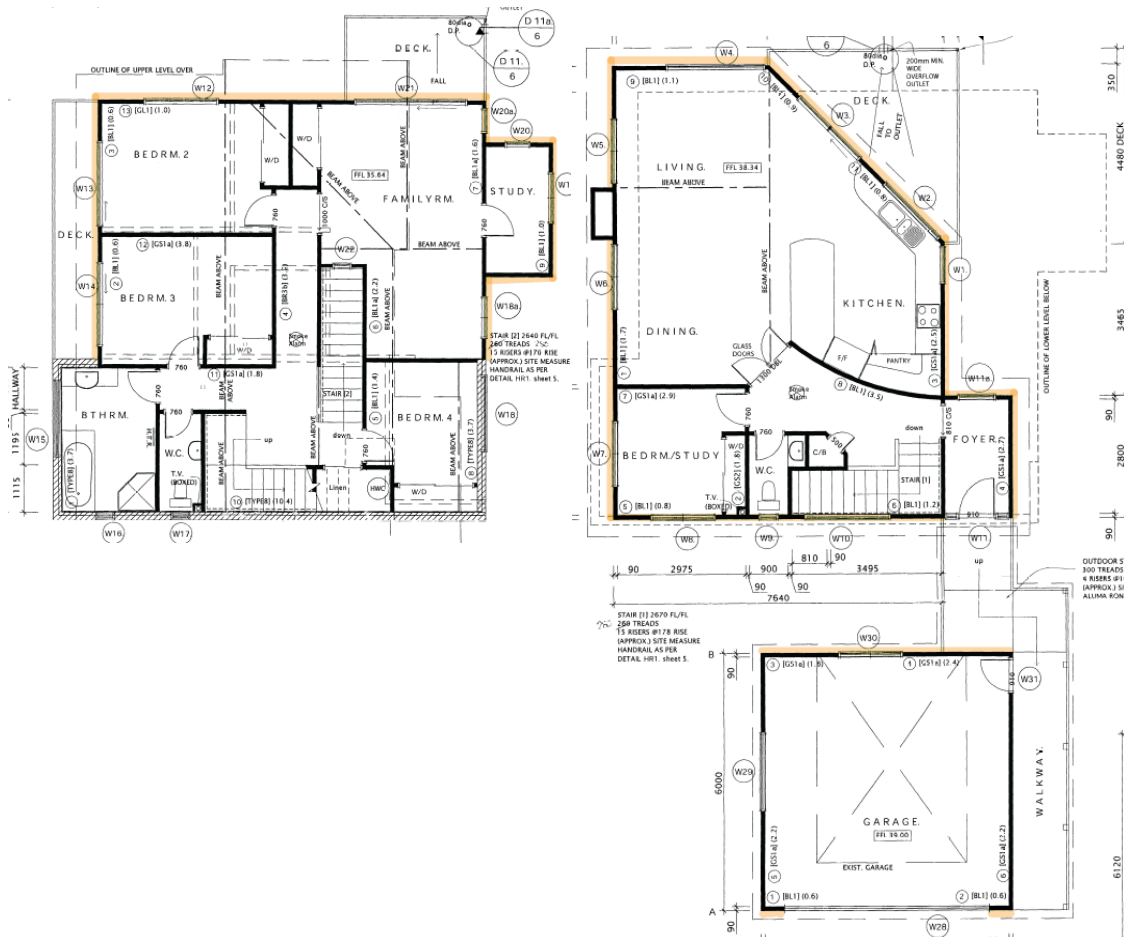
Mid and top floor plans, with elevations to be re-clad shown in orange highlight (not to scale).
